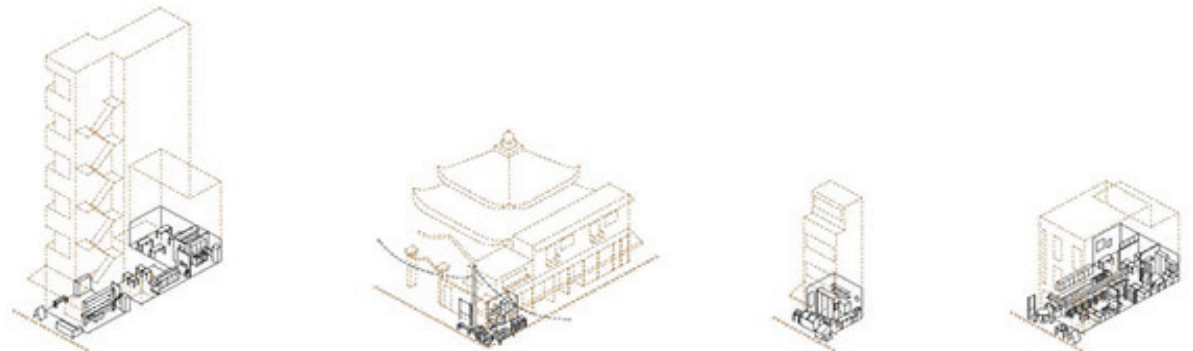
Tsukiji Ground Floor Activation (Colverd, 2014)
